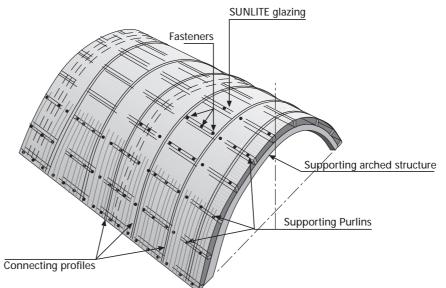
Schematic Depiction of Regular, above Structure Roofing and Cladding Method of Glazing, in a Vaulted Form.
